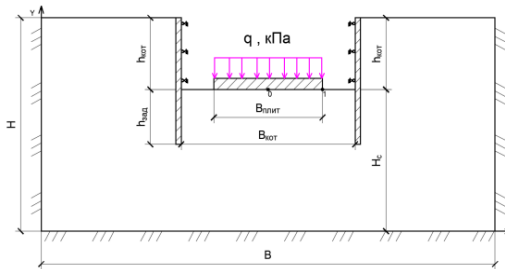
The calculation scheme when the building is located in the centre of the construction site
